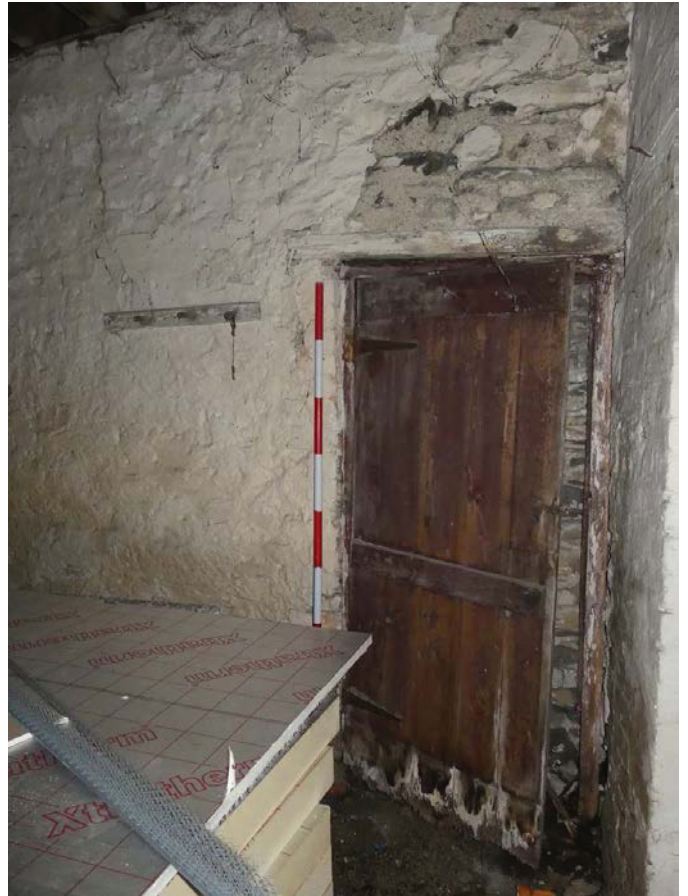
(right): Doorway at the south-east end of the north-east elevation of Room G1
